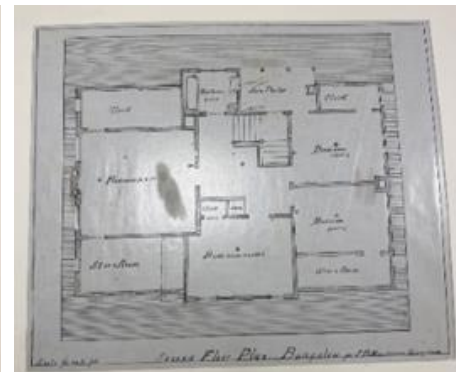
Second Floor Plan, The Birches, 75 Mill Street (EHS ARCHIVES MG12 C6 #44)
